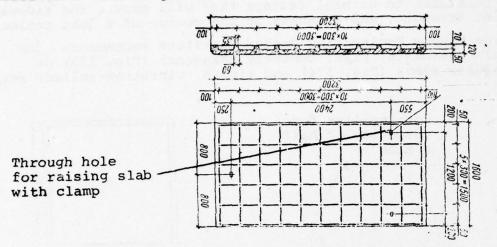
Ribbed, reinforced-concrete sidewalk slab
